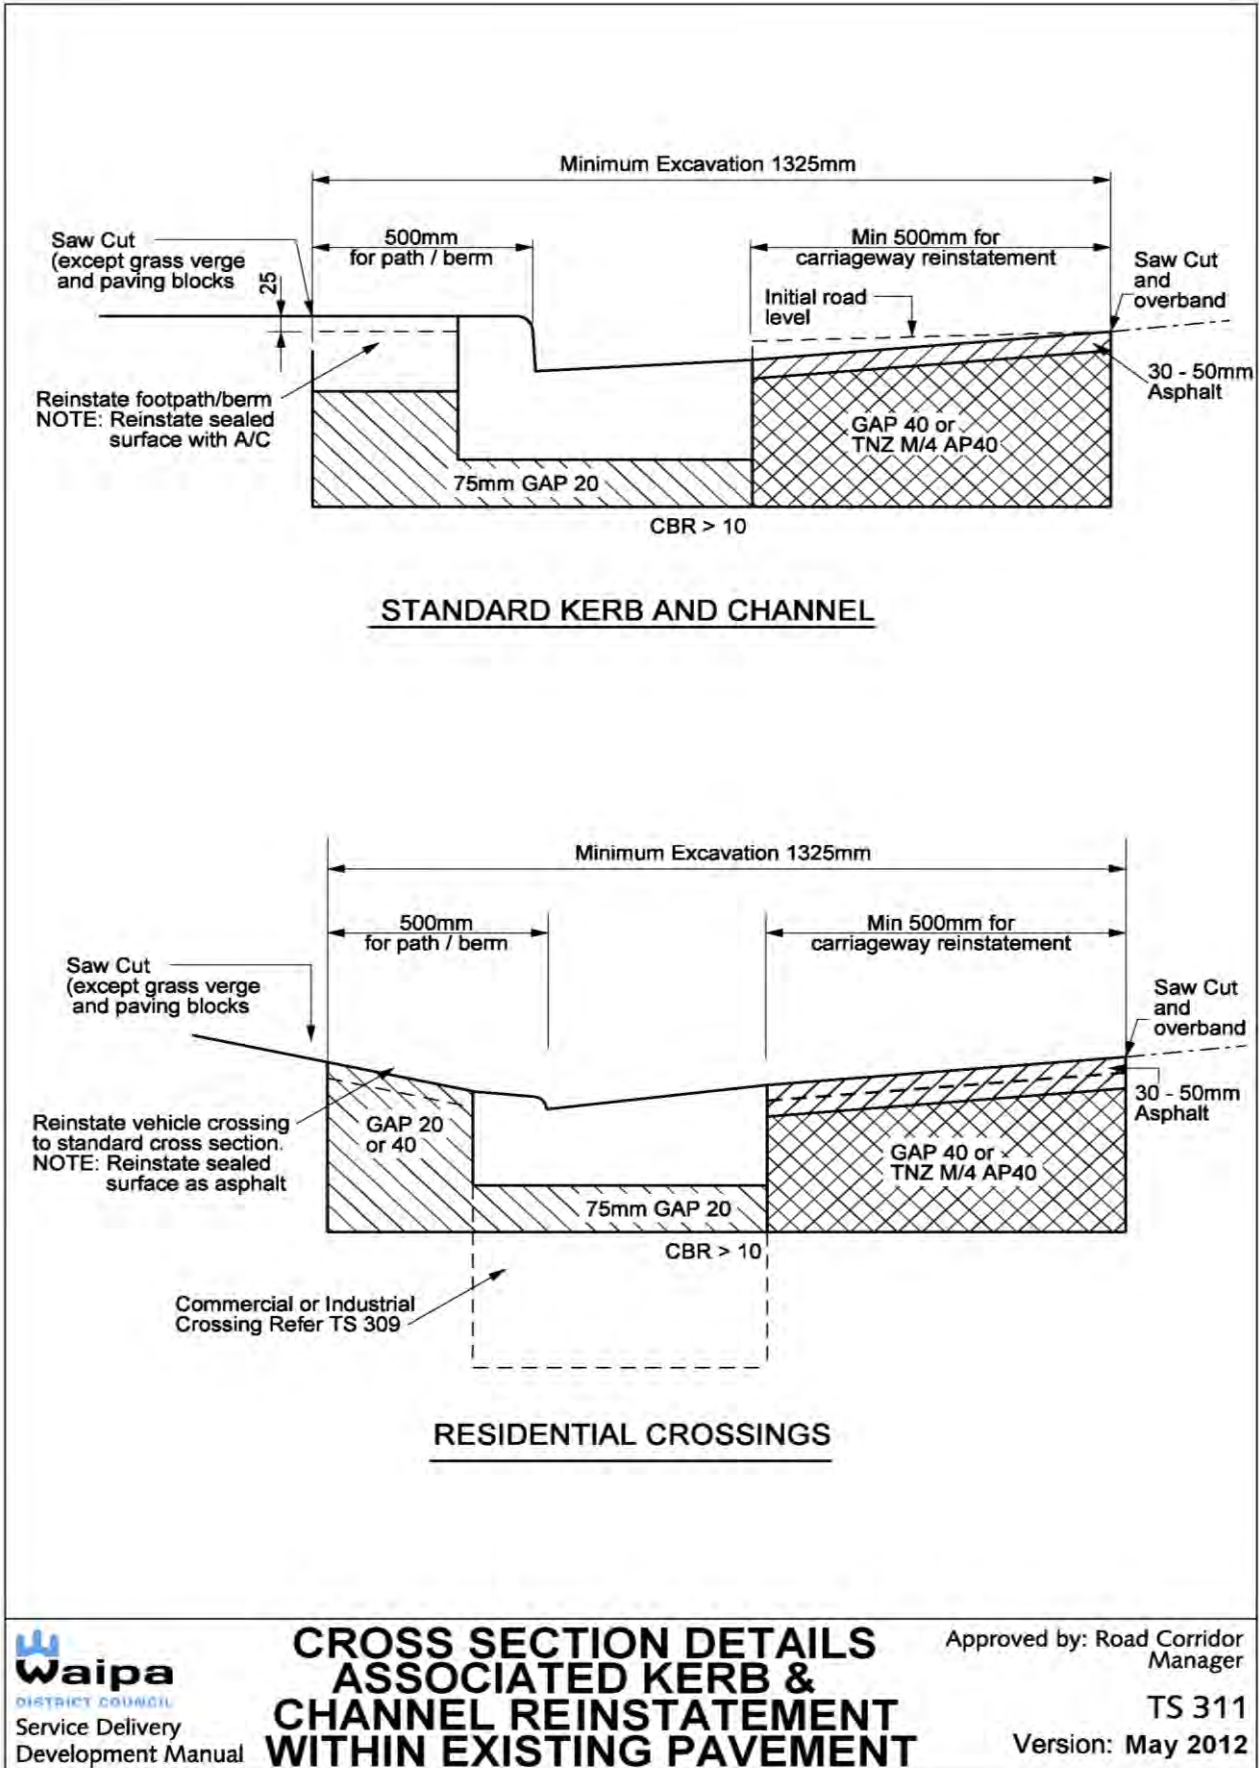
TS 311 Cross section details associated kerb and channel reinstatement within existing pavement
